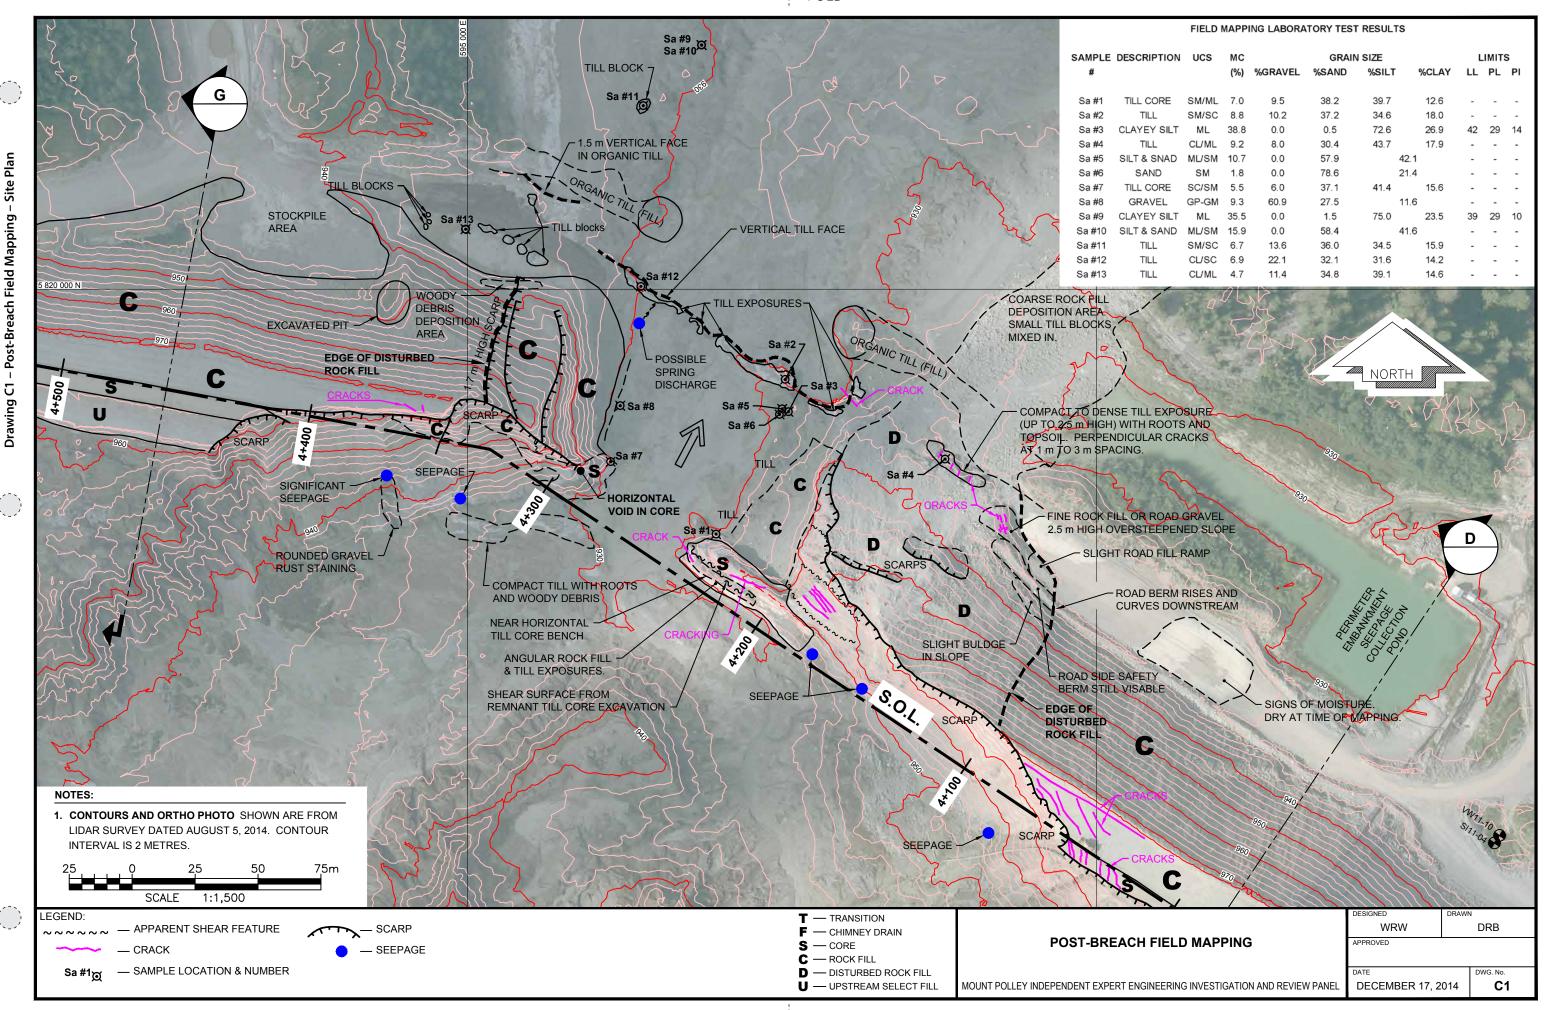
Post-Breach Field Mapping – Site Plan
